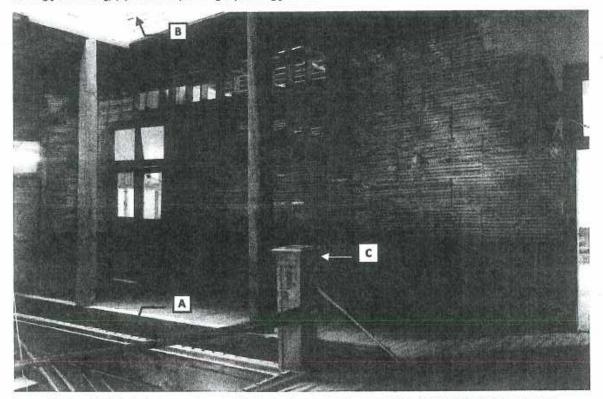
Level 3 Stair Hall view southeast. (A) Handrall and spindles are missing, (B) Skylight, (C) Newel post is missing finial. 90
